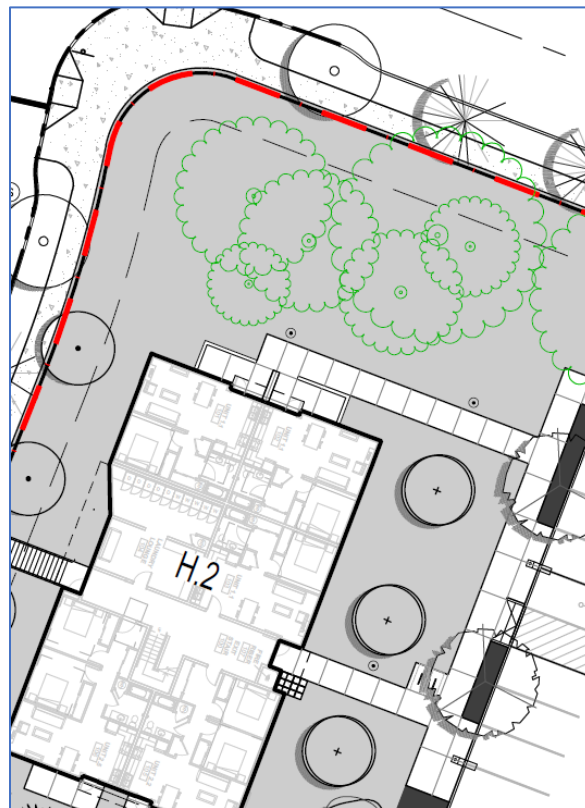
Northeast corner unit has entrance facing east, rather than to Teal sidewalk.
